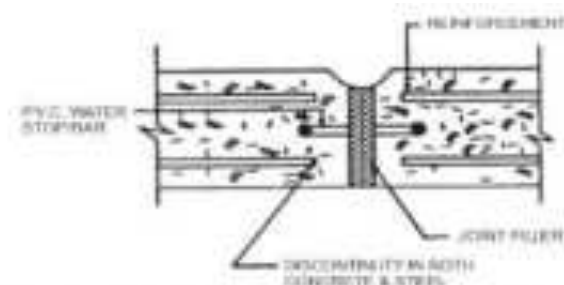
Expansion Joint Subjected to Water Pressure (For Water Tanks)
